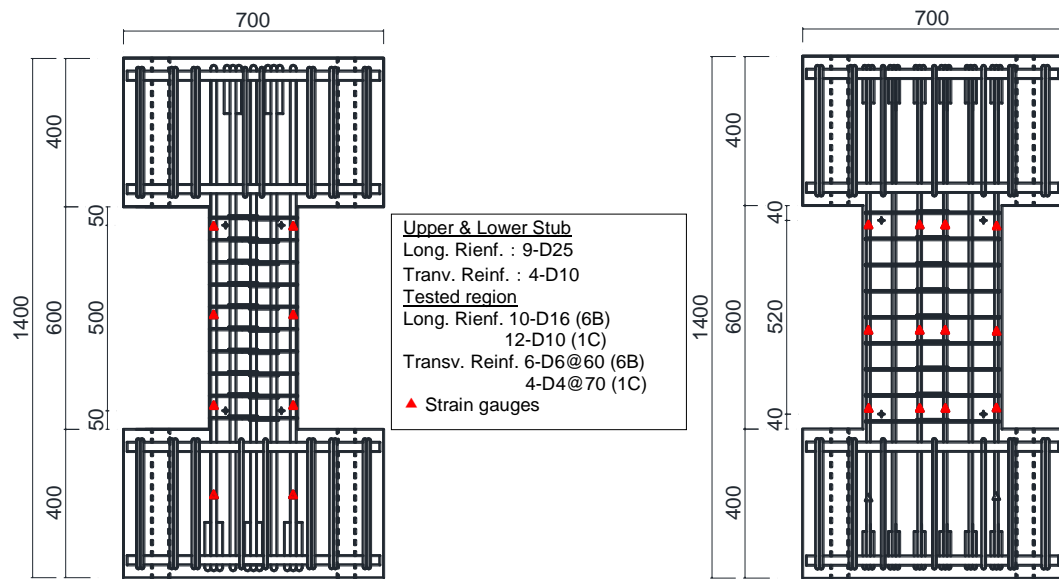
Vertical reinforcement layout of 6B-M/6B-C (left) and 1C-M/1C-C (right)
